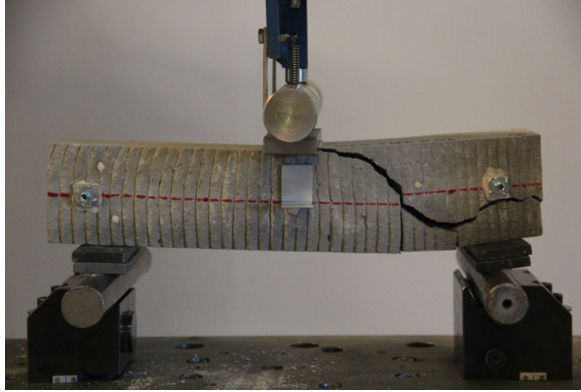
Specimen 3PB- after flexural shear failure in 3-point bending test.
